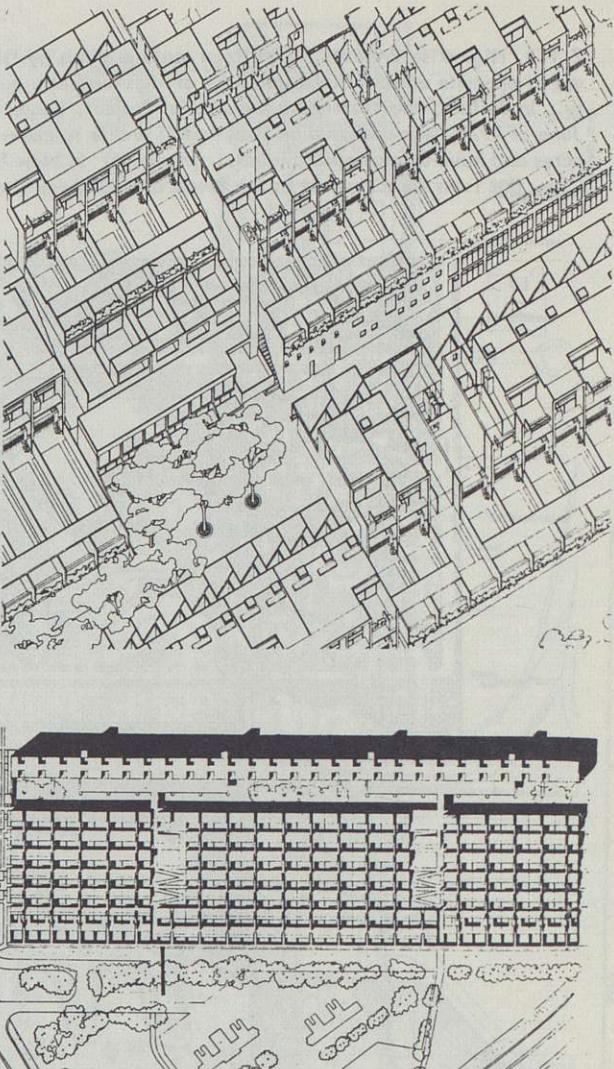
Siedlung Halen (Berne, CH): Axonometric/Portsdown Housing Competition (Portsmouth, England): Site Plan.
